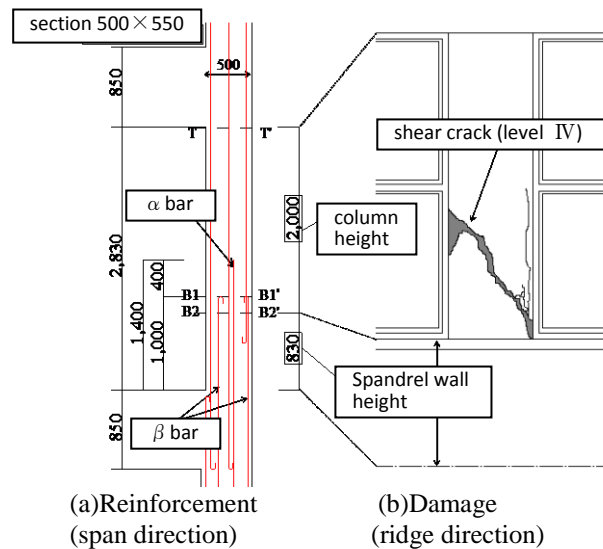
Reinforcing arrangement of 2F-A4 column and the observed damage
